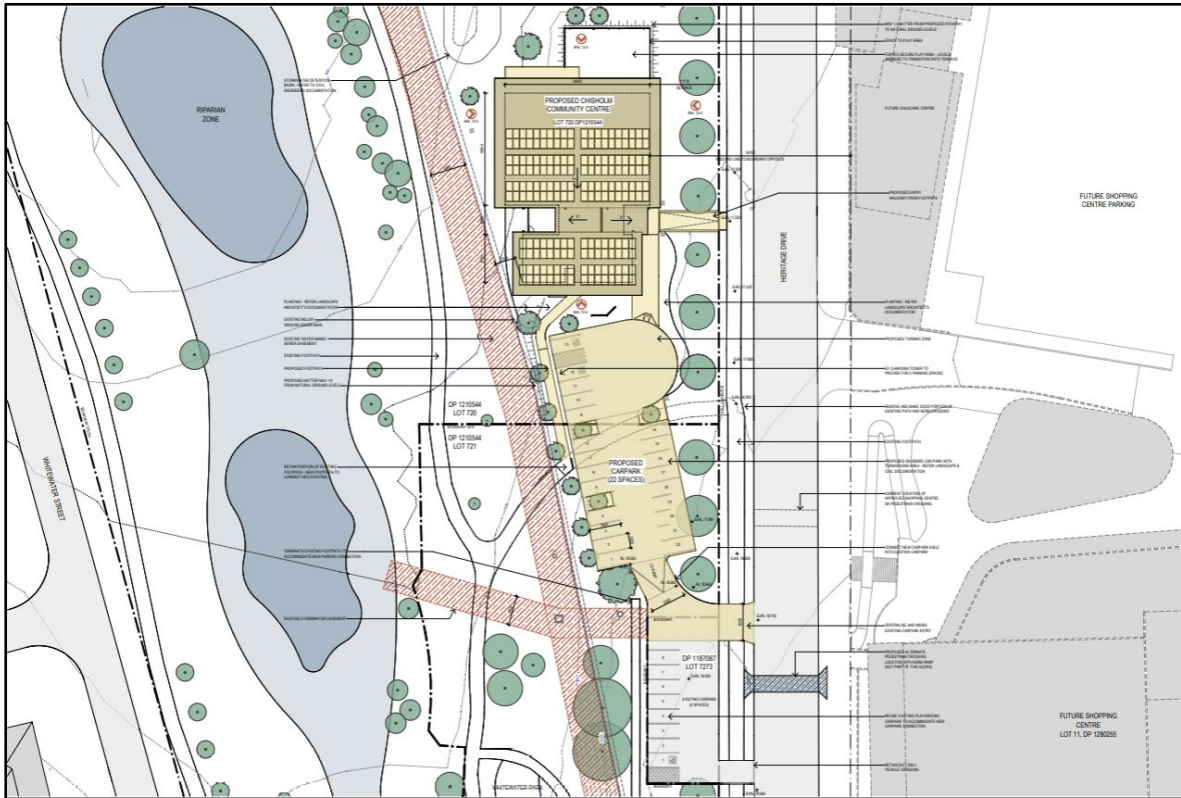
Proposed Site Plan. Source: AJC Architects dated 23 April 2024
